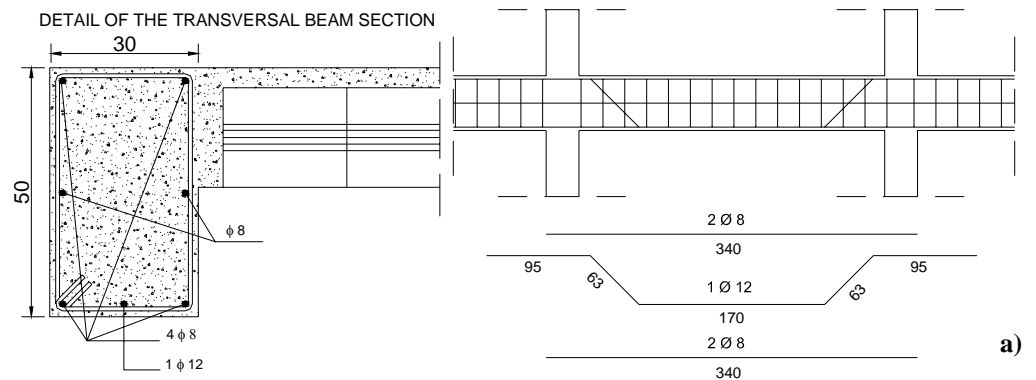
Steel reinforcement of beams (a), foundation beams (b) and columns (c)(length unit: cm) (continues)
